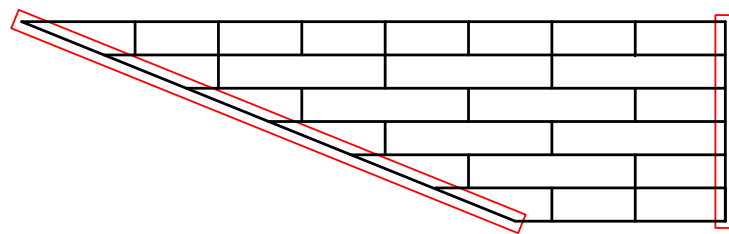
Beneficial Staggered Cross-Frame Framing Arrangement for a Straight Bridge with Non-Parallel Skew
